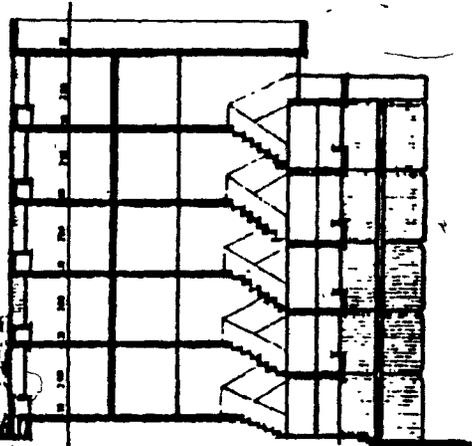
Prototype of two room apartment in five story building designed by Housing Ministry in 1973.
